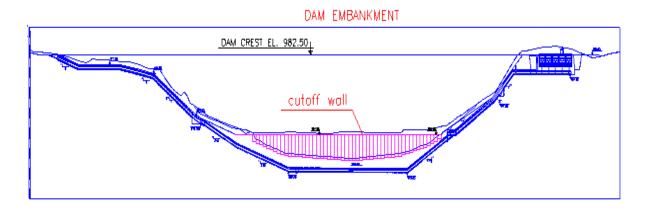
Cross-Section of the Dam Body and Cutoff Wall
